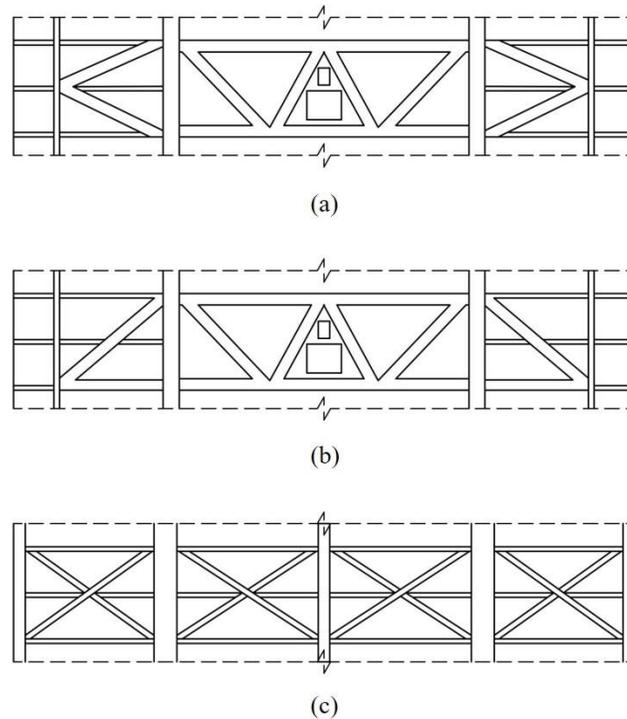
Sections of a) Outrigger type I, b) Outrigger type II, and c) Belt truss.
